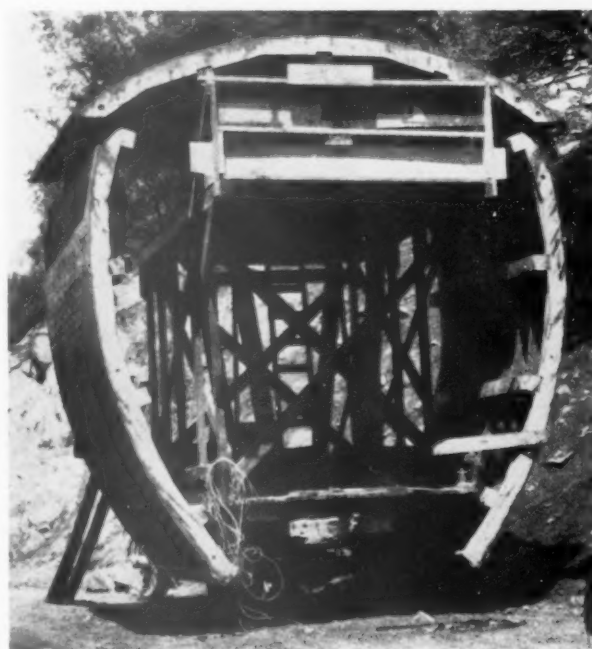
COLLAPSIBLE STEEL FORM USED IN LINING THE BIG OAK FLAT TUNNEL.
